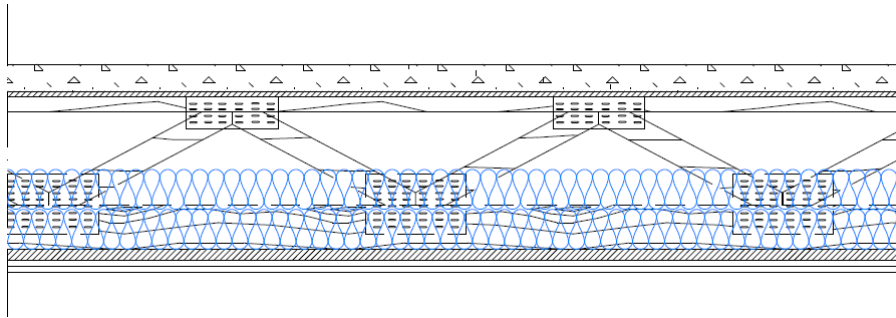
Trusses in the SEPA-2000 system (SEPA GROUP)
